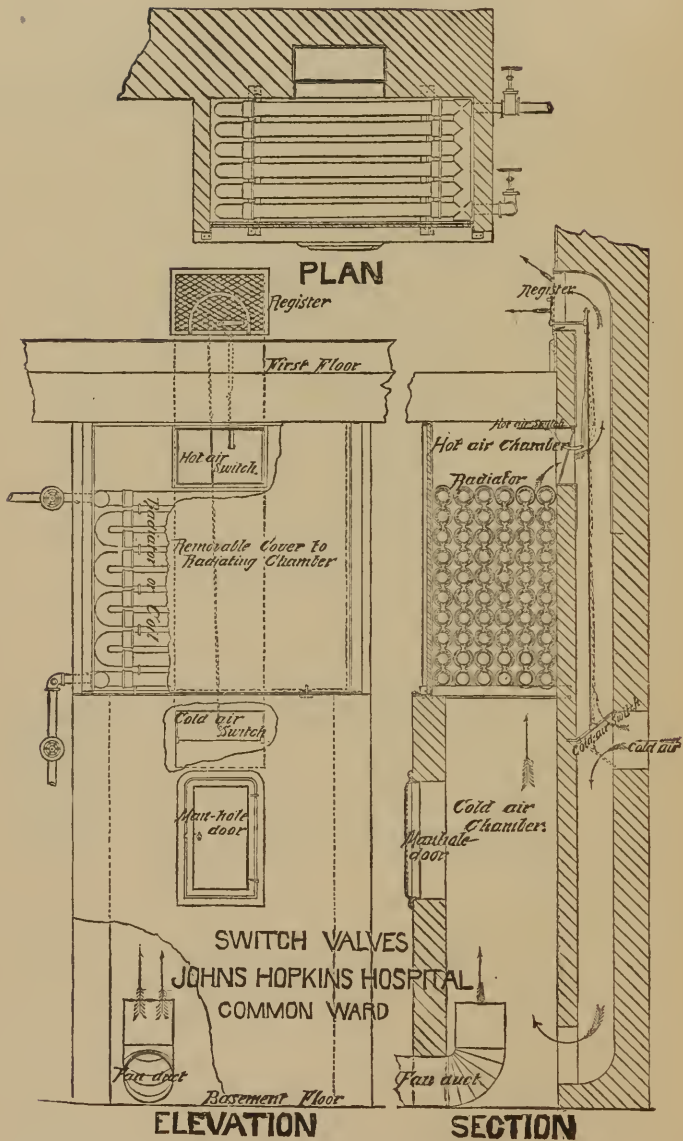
HEATING COILS AND SWITCH VALVES.—JOHNS HOPKINS HOSPITAL.
